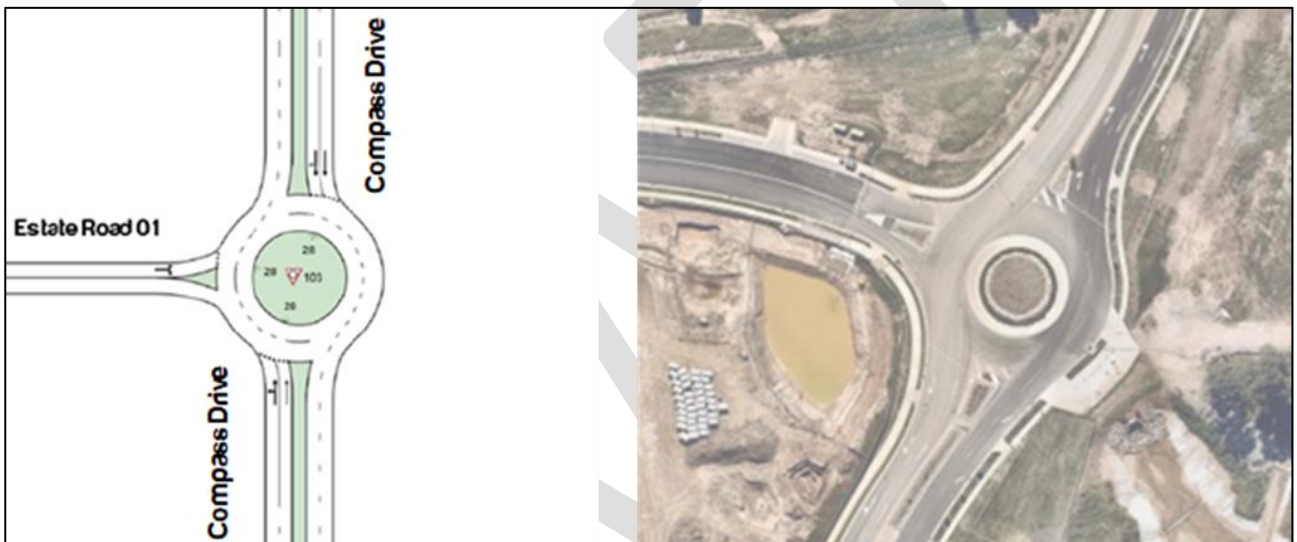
Intersection Layout of Compass Drive & Emporium Avenue
